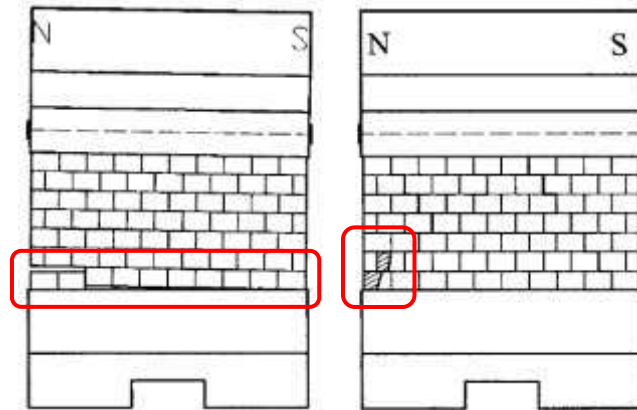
Rocking type of failure of URM walls (EIGawady et al., 2007)
